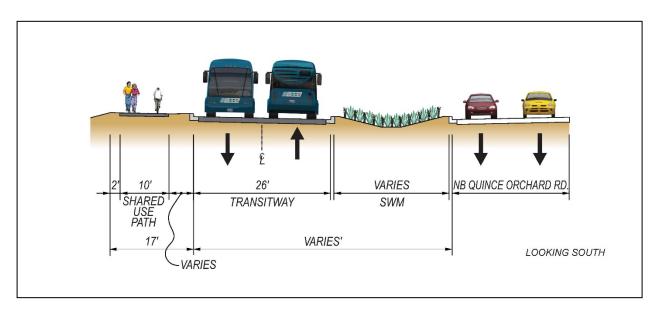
CCT Typical Section at Metropolitan Grove Station
